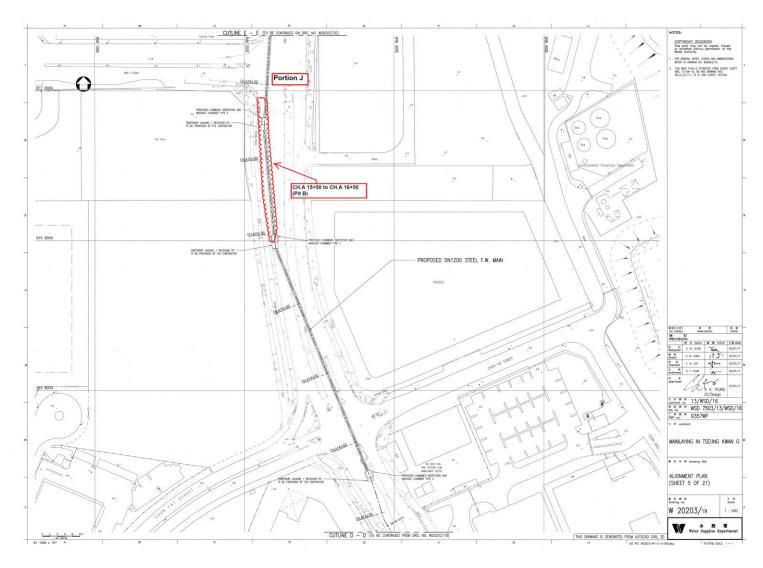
Location Plan for Portion J – CH. A15+50 to CH.A 16+50 (Pit B)
